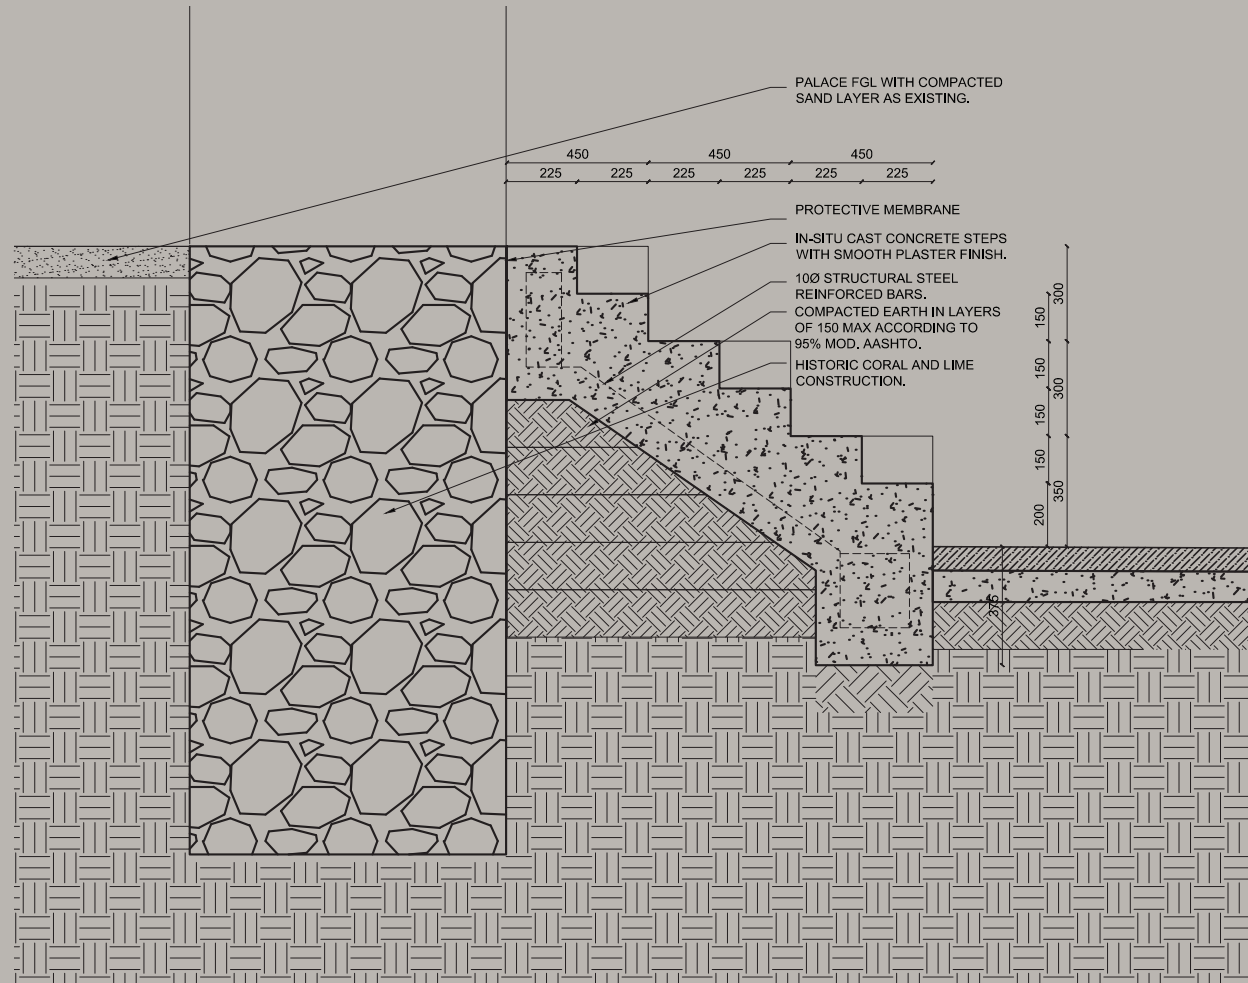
Detail Section (1:20) of New Steps in Ruins (Author, 2014).
